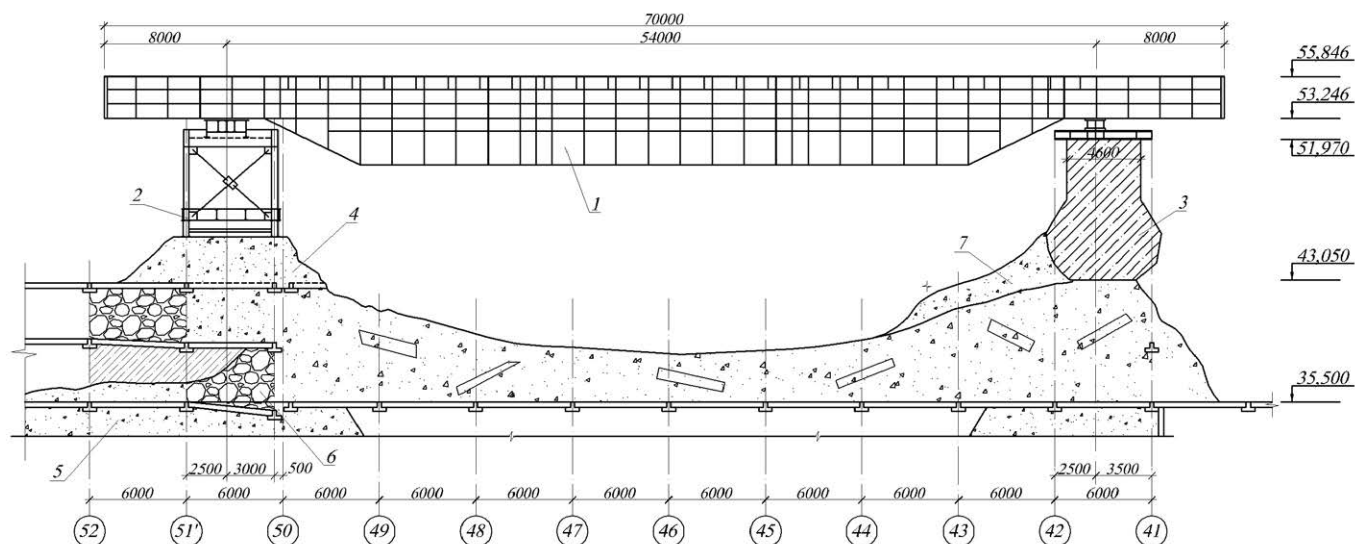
The layout of the Mammoth Beam: 1 — the Mammoth Beam; 2 — western supporting structure; 3 — eastern supporting structure; 4 — building materials debris, reinforced with concrete at the supporting structures; 5 — concreted premises of the deaerator stack; 6 — concrete bags; 7 — supporting structure concrete reinforced rock installation
